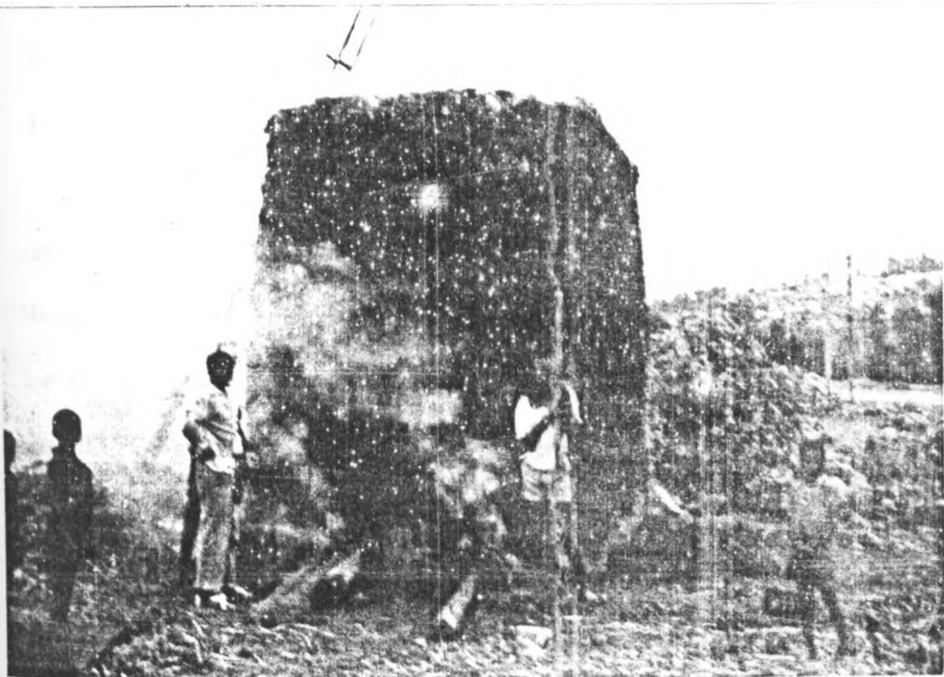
Brick burning in the kiln, has 5000 bricks.
